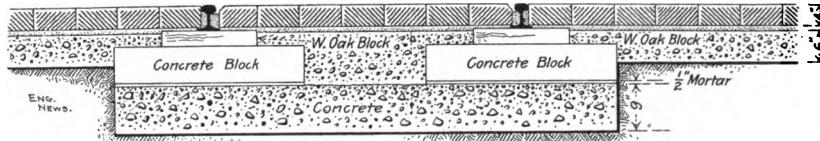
Section of Track Showing Use of Concrete Ties, Pere Marquette Railway.
